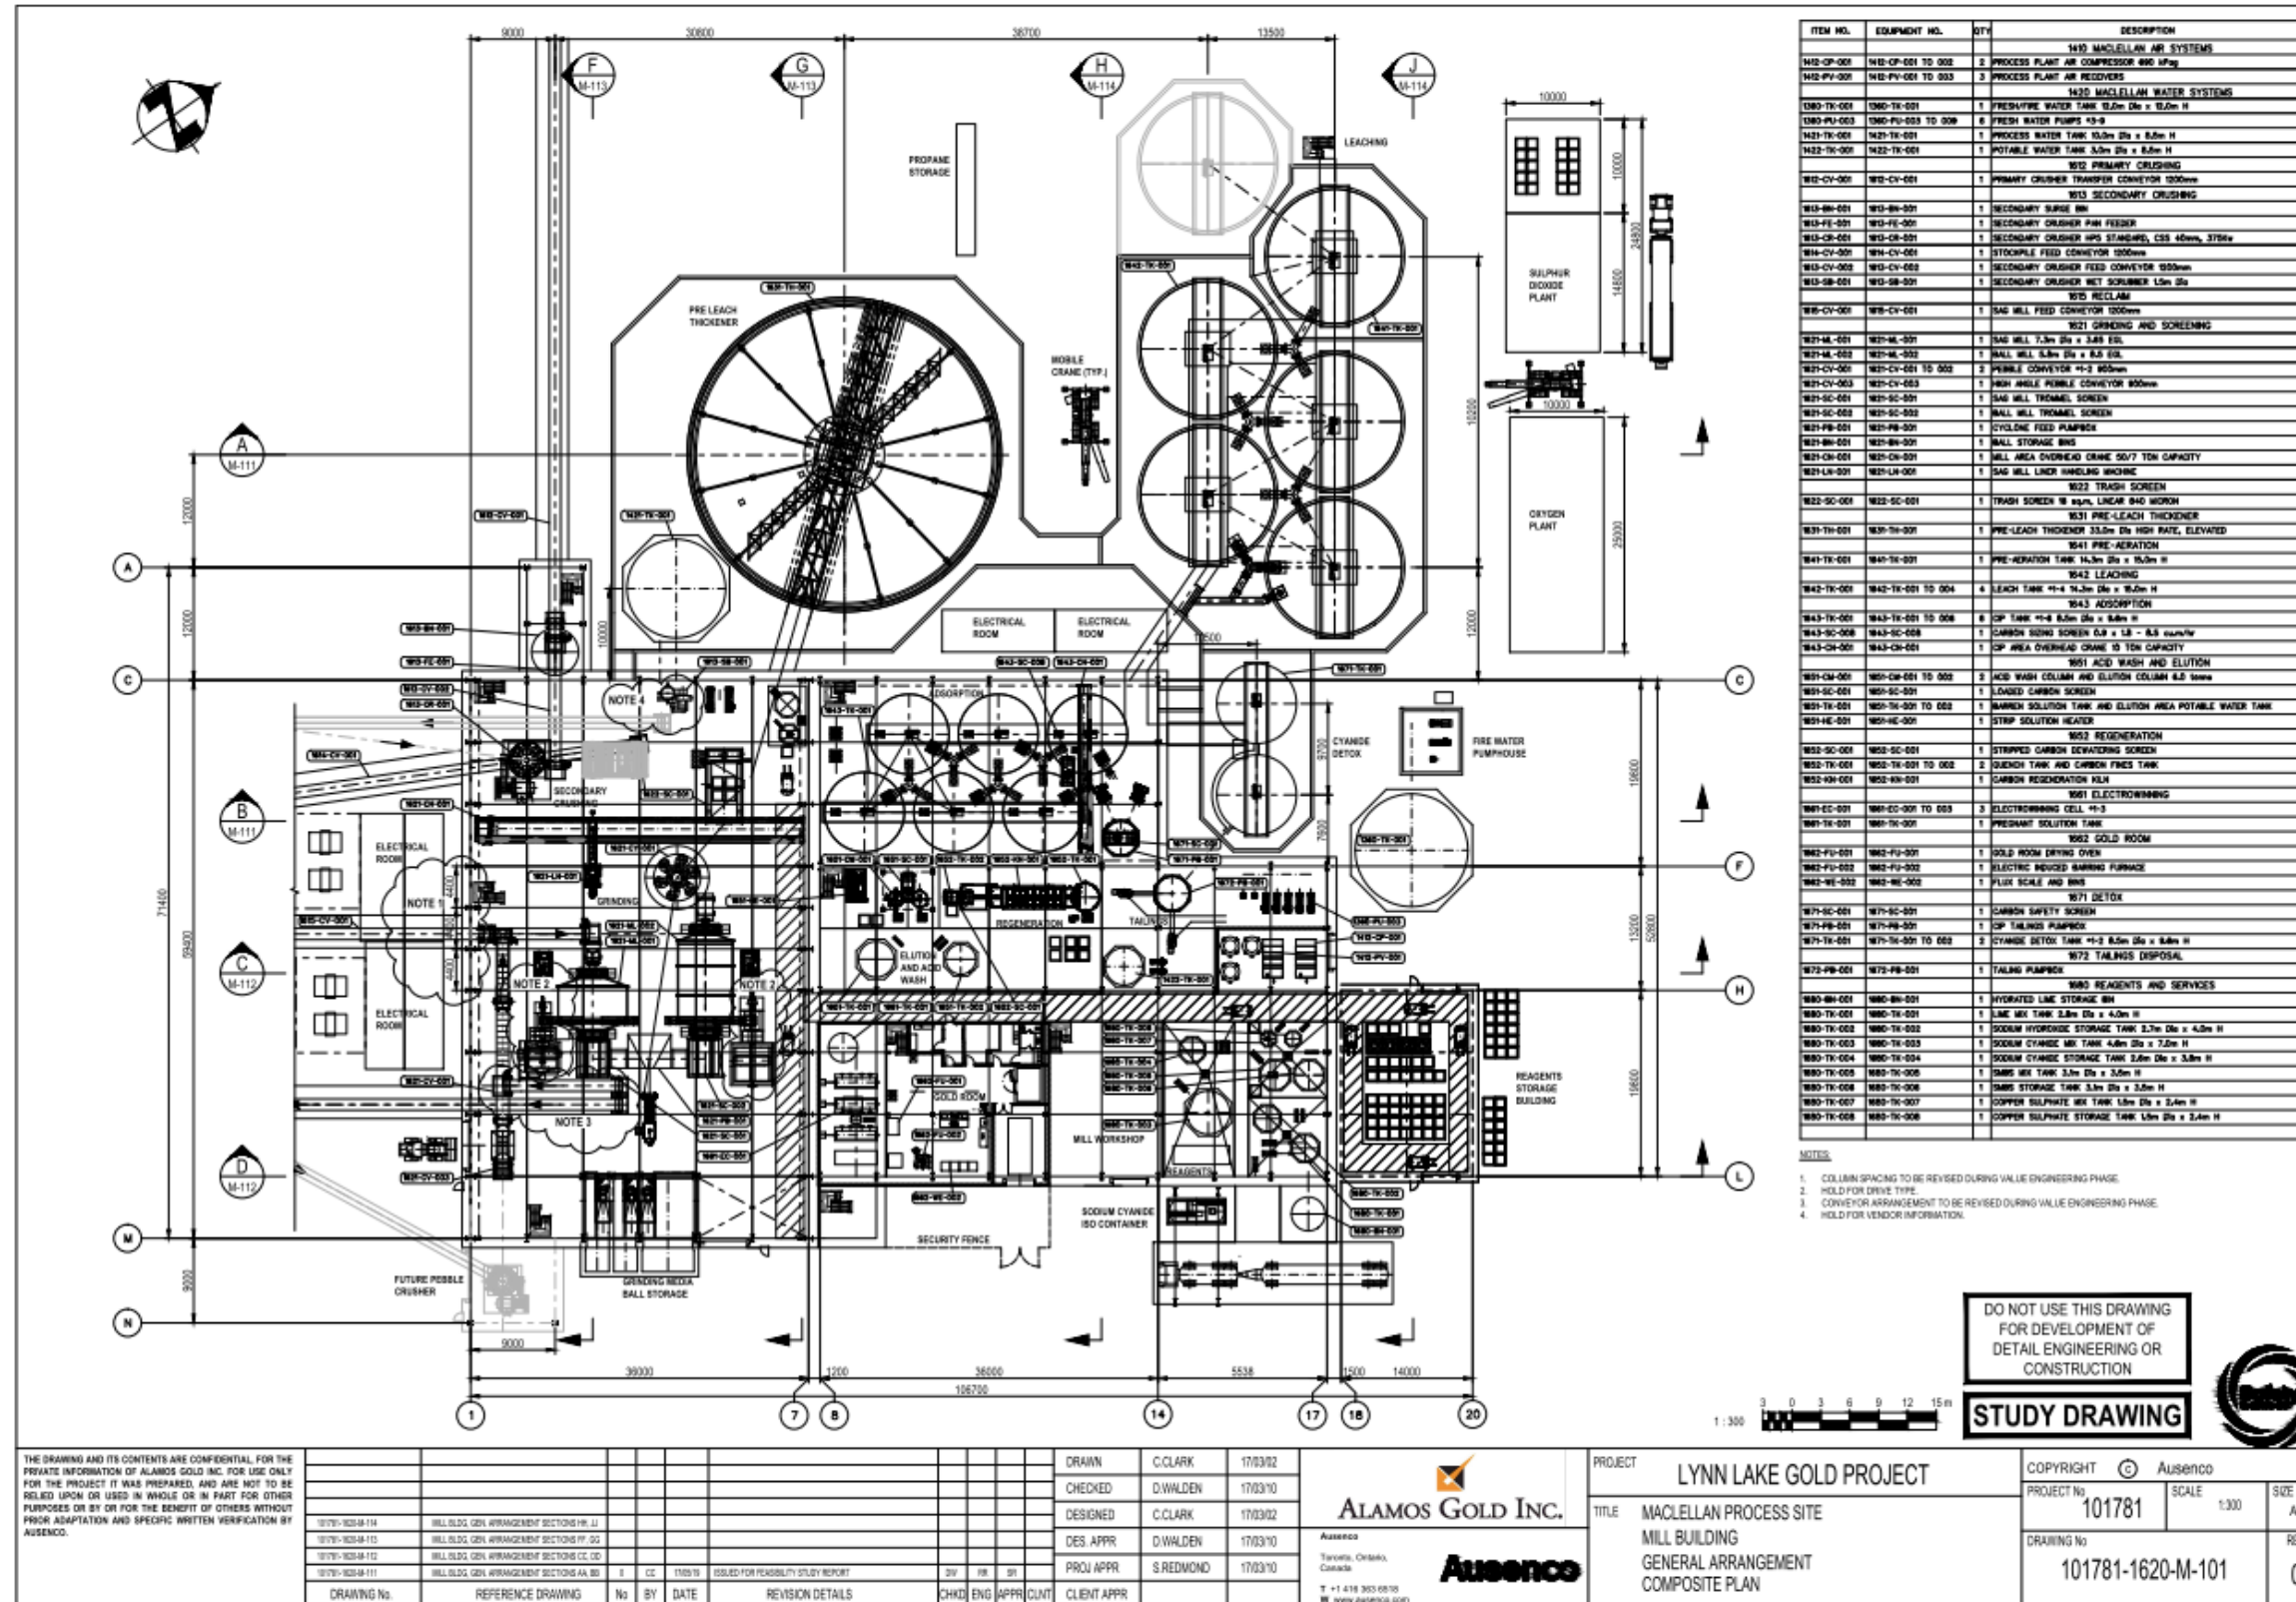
MacLellan Mill Building General Arrangement, Composite Plan
